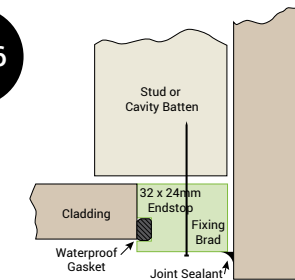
External Cross with Timber Corner (install prior to cladding)
